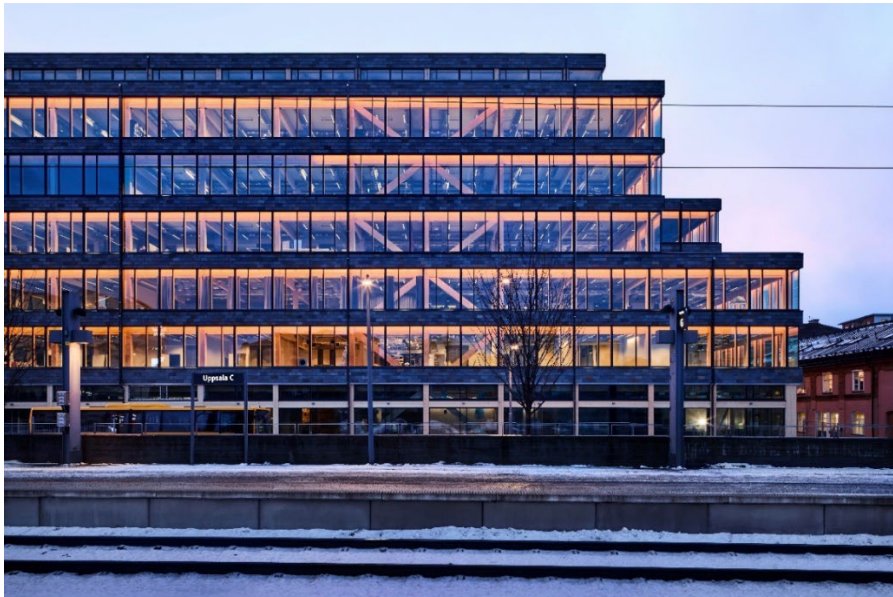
Façade towards the railway, the timber frame made visible interior lighting.
